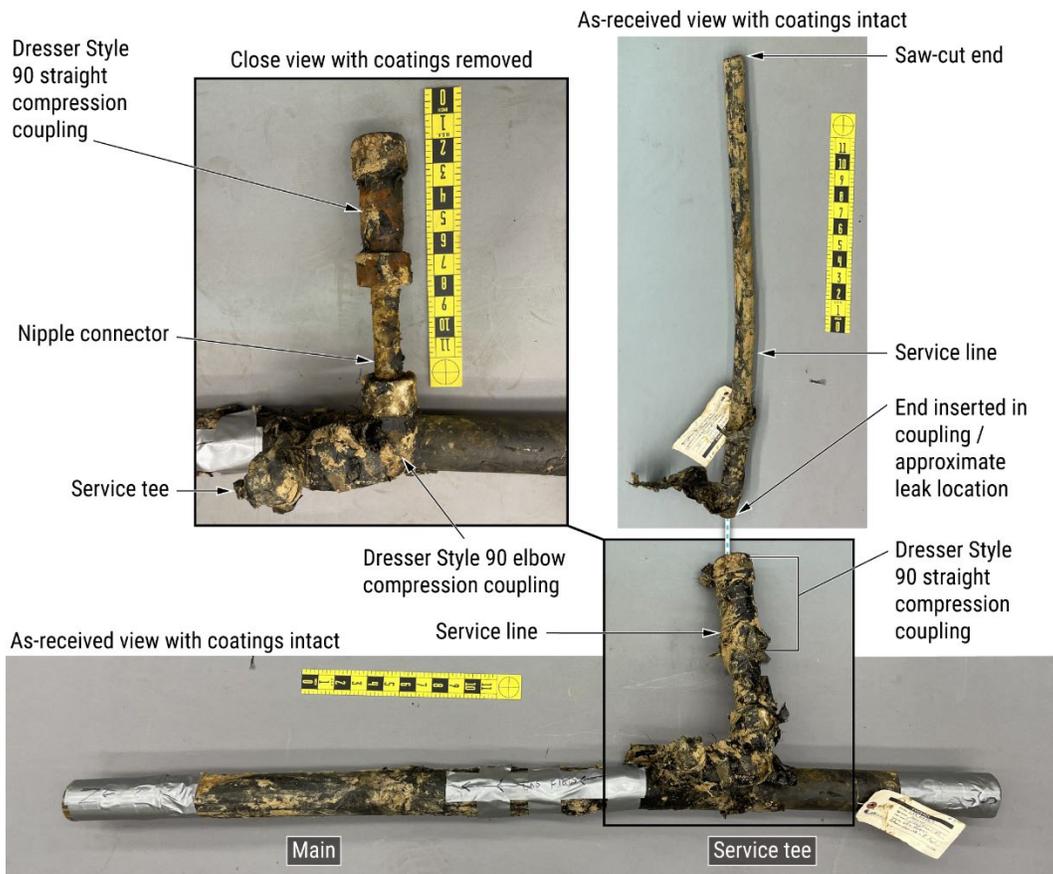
The Bristol Boulevard natural gas pipeline assembly.
